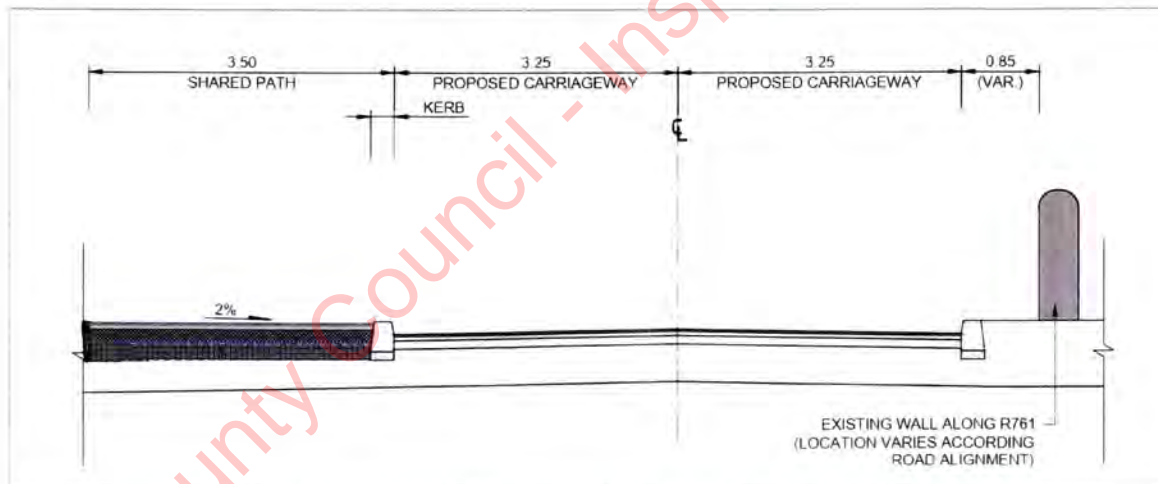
Typical Cross Section (AECOM Drawing: PR60659397-ACM-XX-00-SK-CE-00-0009)
